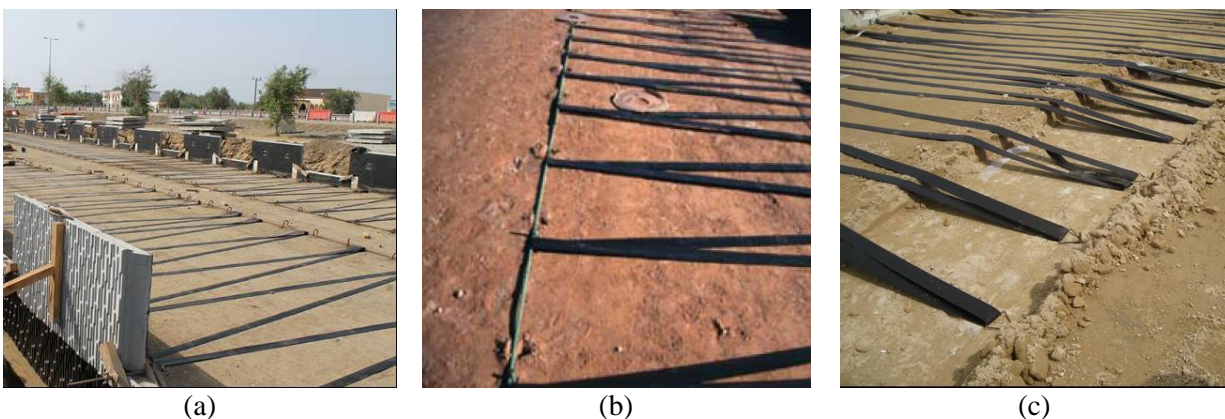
On-site polymeric strip installation examples: (a) back-to-back wall case, (b) longitudinal bar back anchorage and pegs, and (c) trench and triangle anchorage. (Photographs courtesy of VSL Construction Systems—VSoL® Retained Earth System).
